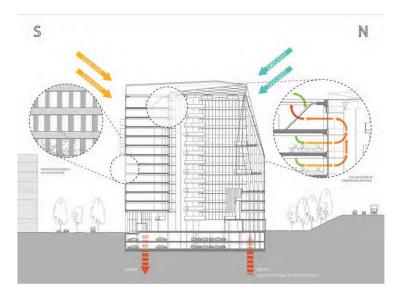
Sun Interaction with Building Envelop and Air Circulation Mechanism (PLP Architects, 2018)
